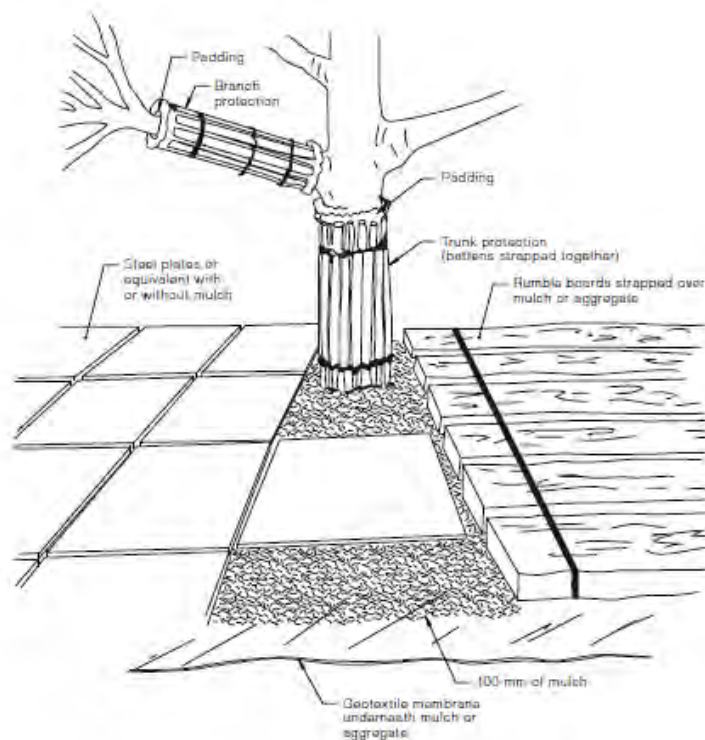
Example of trunk, branch and ground protection (Source: AS 4970-2009).
